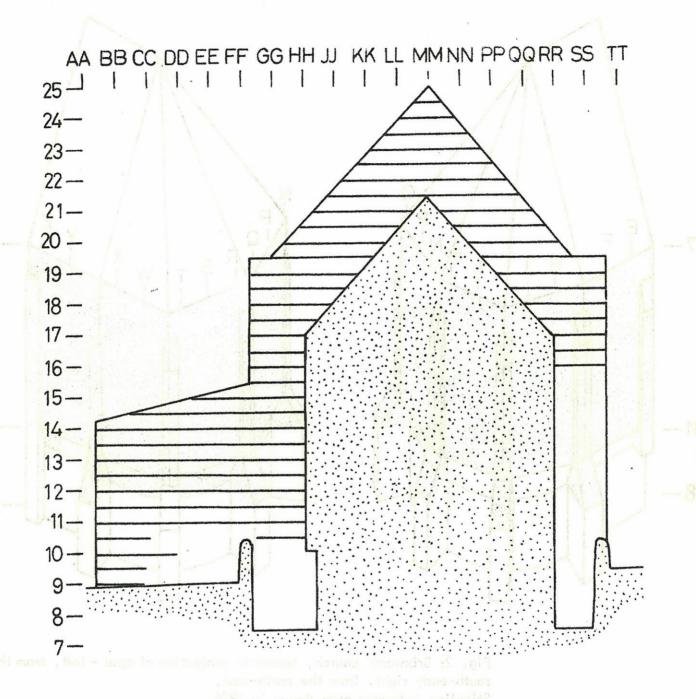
Brixworth church, east elevation of choir and Verdun chapel. Horizontal bars indicate area drawn in 1976.
